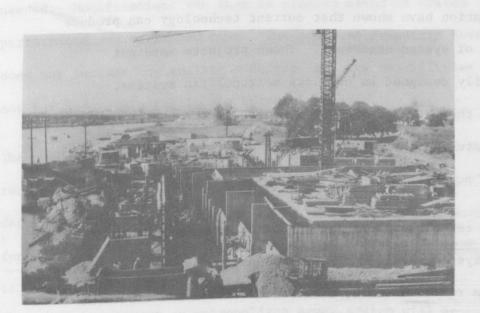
Concrete tank construction of detentionchlorination facility, MDC, Boston, Mass.
